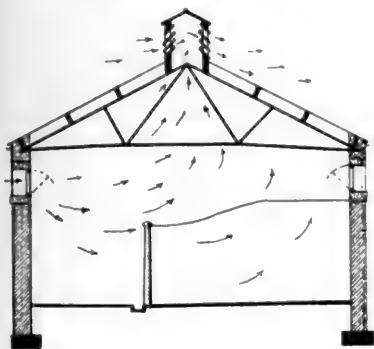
Showing the method of ventilating a stable with hopper inlet windows and a louver-board outlet fitted on the roof ridge.
